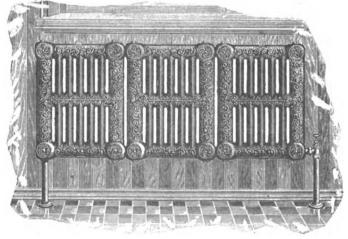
Cast-Iron Sectional Radiator of Wall Pattern.
